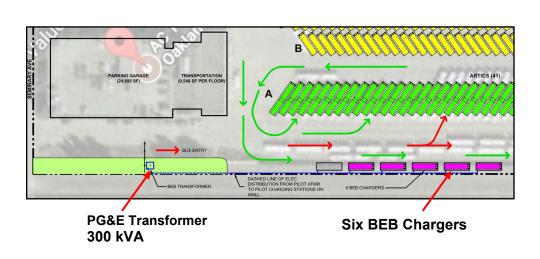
Division 4 Proposed BEB Installation Site Plan
